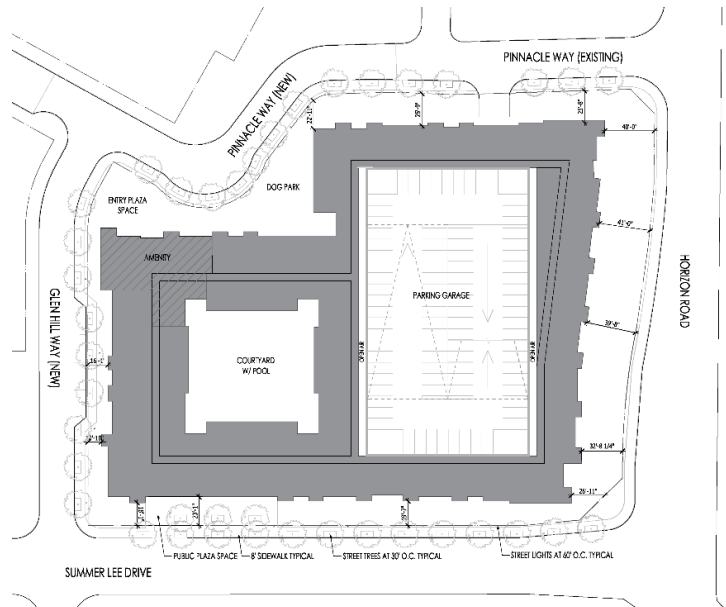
PROPOSED CONCEPT PLAN WITH REVISED BUILDING FOOTPRINT
